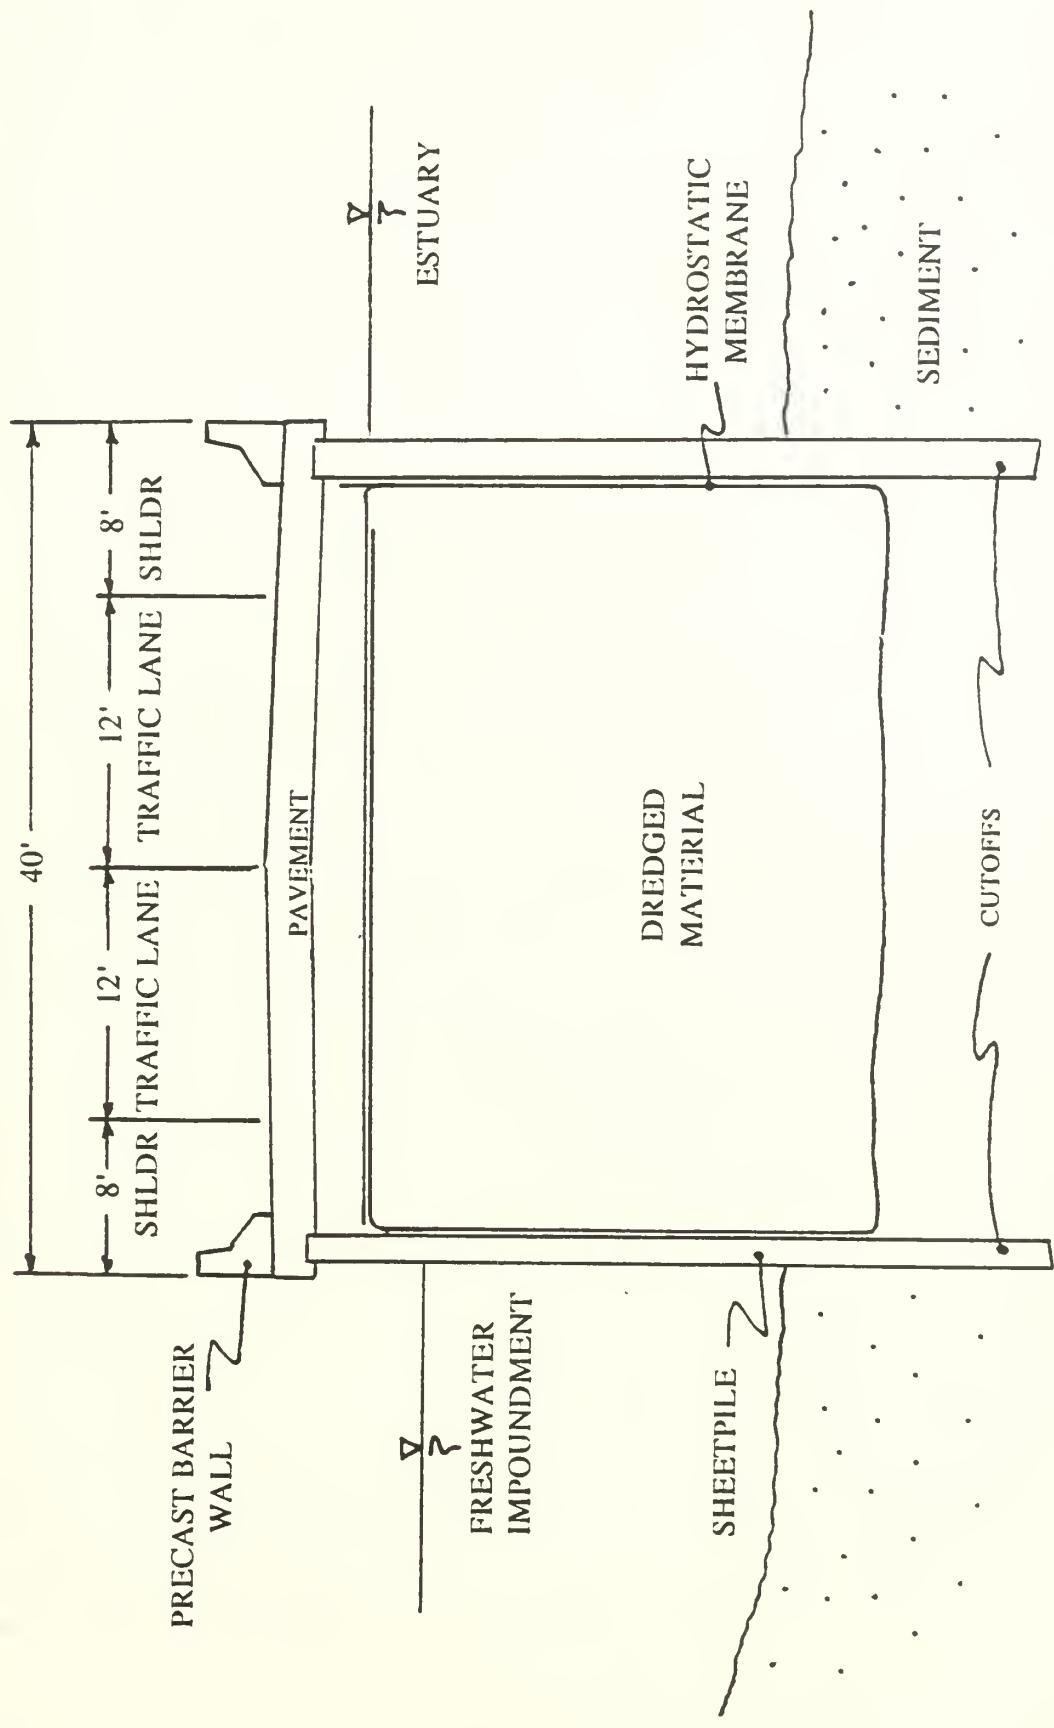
LIMITED CROSSSECTION EARTHII DAM
